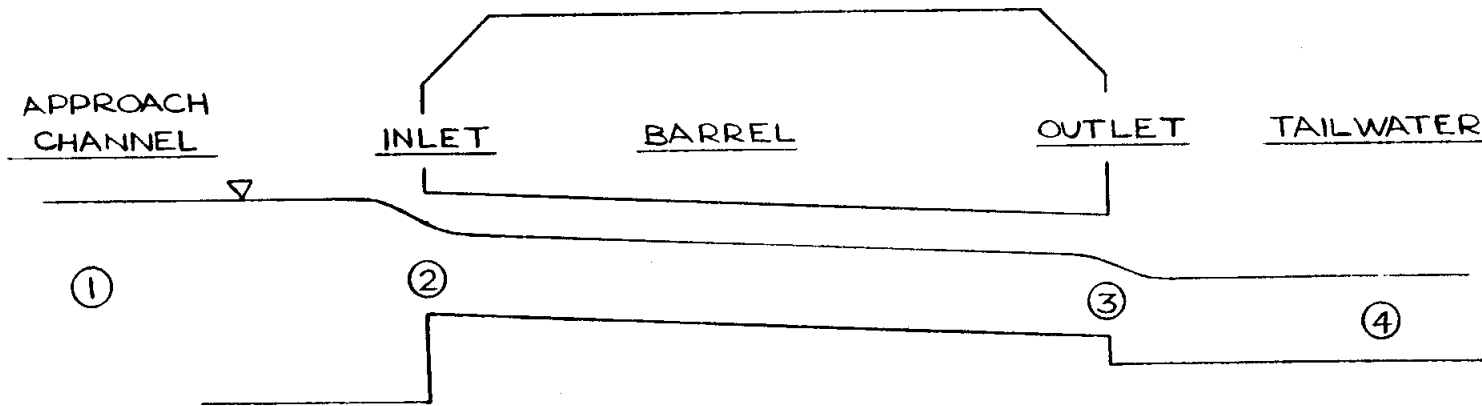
Flow sections of a culvert (after Bodhaine, 1968).
